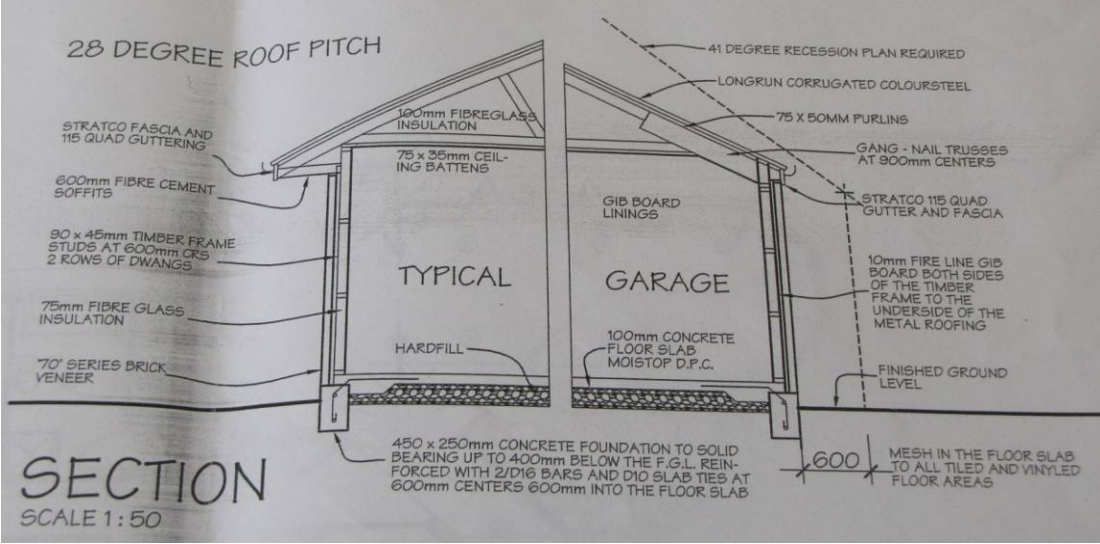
Concrete slab-on-ground details for the Bexley houses.
